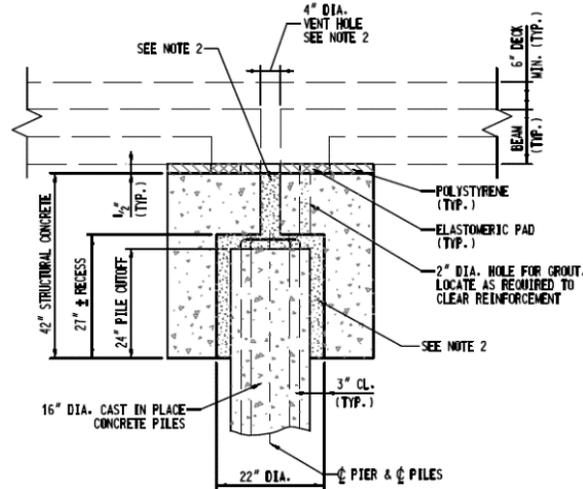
Precast cap beam and cast-in-place column using grouted pocket [8].
